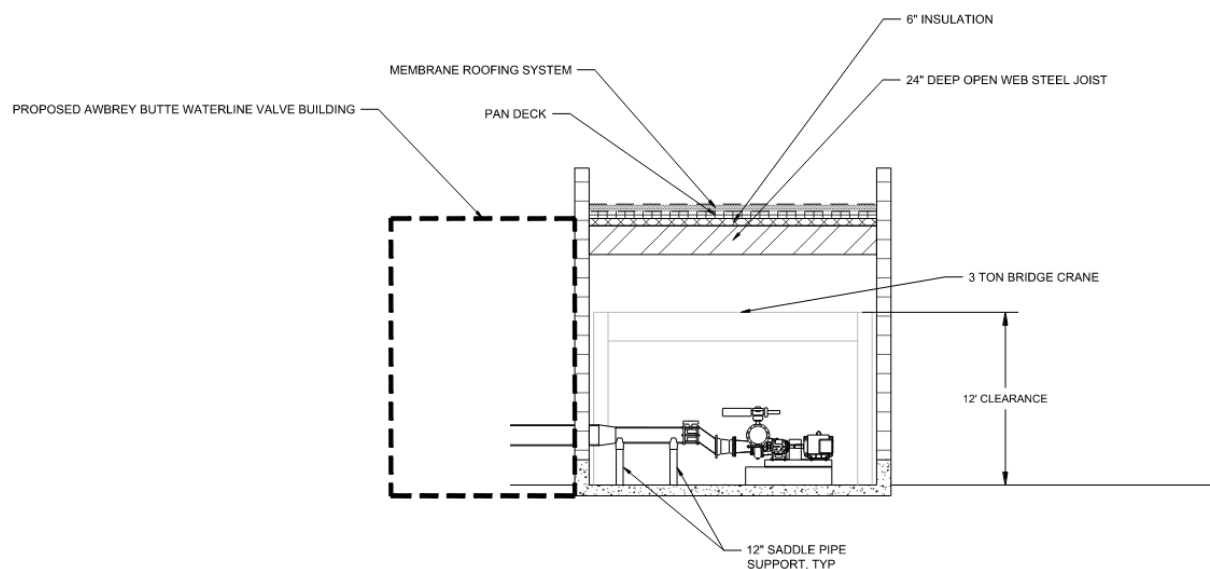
Building Layout of Proposed In-conduit Hydropower Facility, Section B
